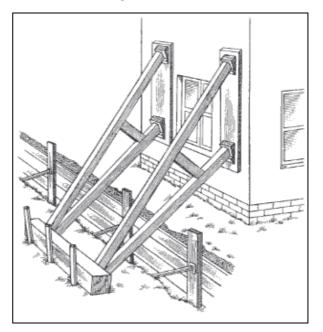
Excavation near a building: Shoring required to prevent collapse of the building
